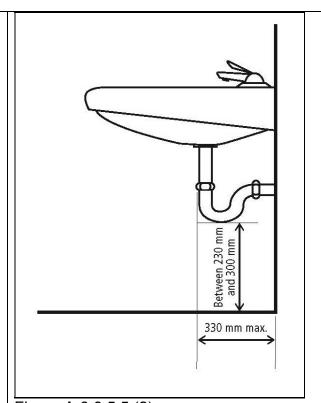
(2) Indications for the lavatory plumbing
